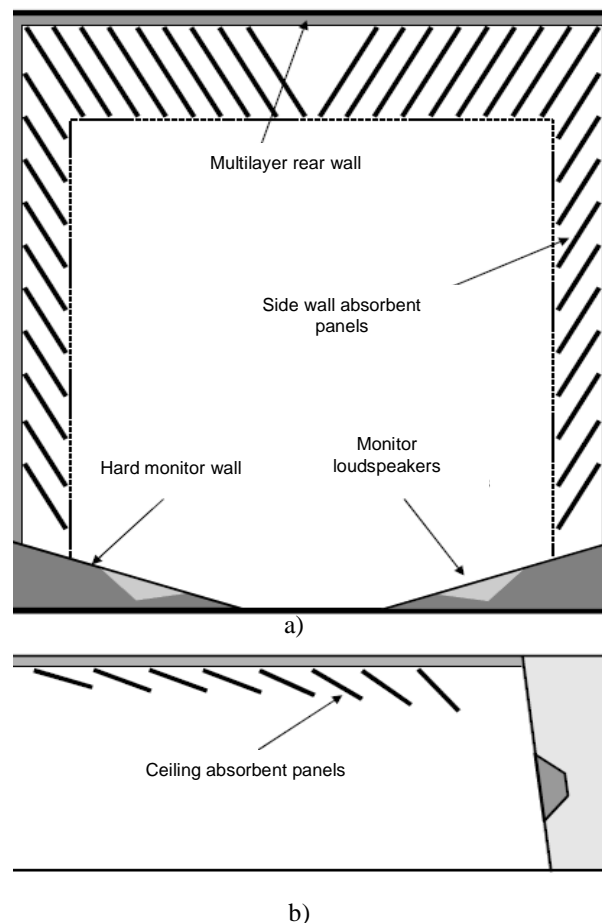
Panel placement inside the control room; a) floor plan; b) cross section
